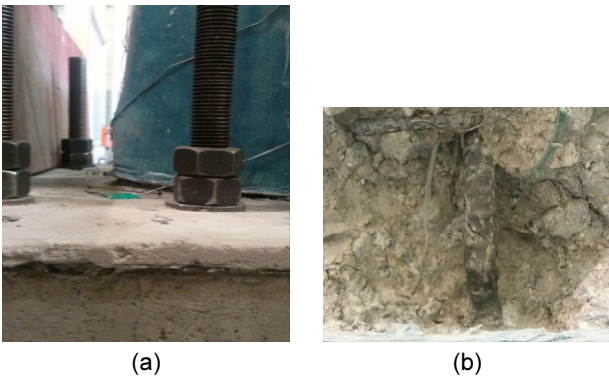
C-PET: (a) concrete bulging, $8\Delta_y$ (b) column main bar tensile fracture
